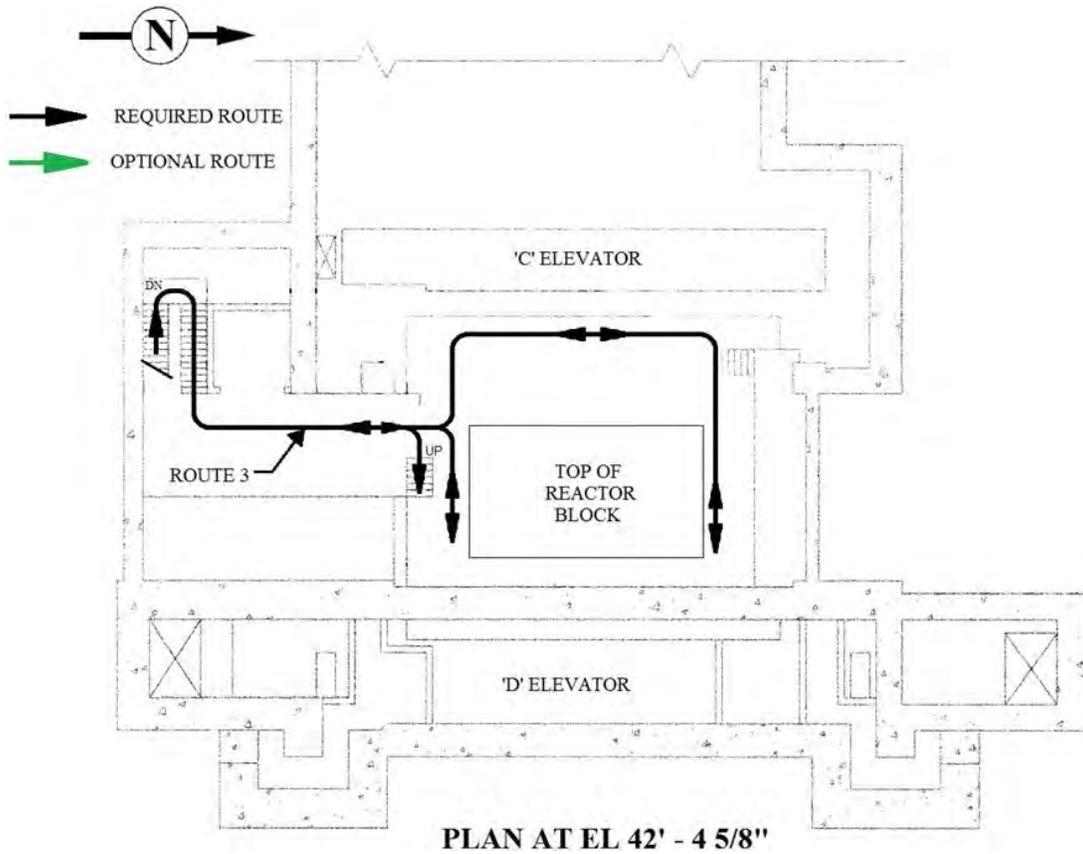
105-DR Safe Storage Enclosure Floor Plan Elevation 42 ft - 45/8 in.
